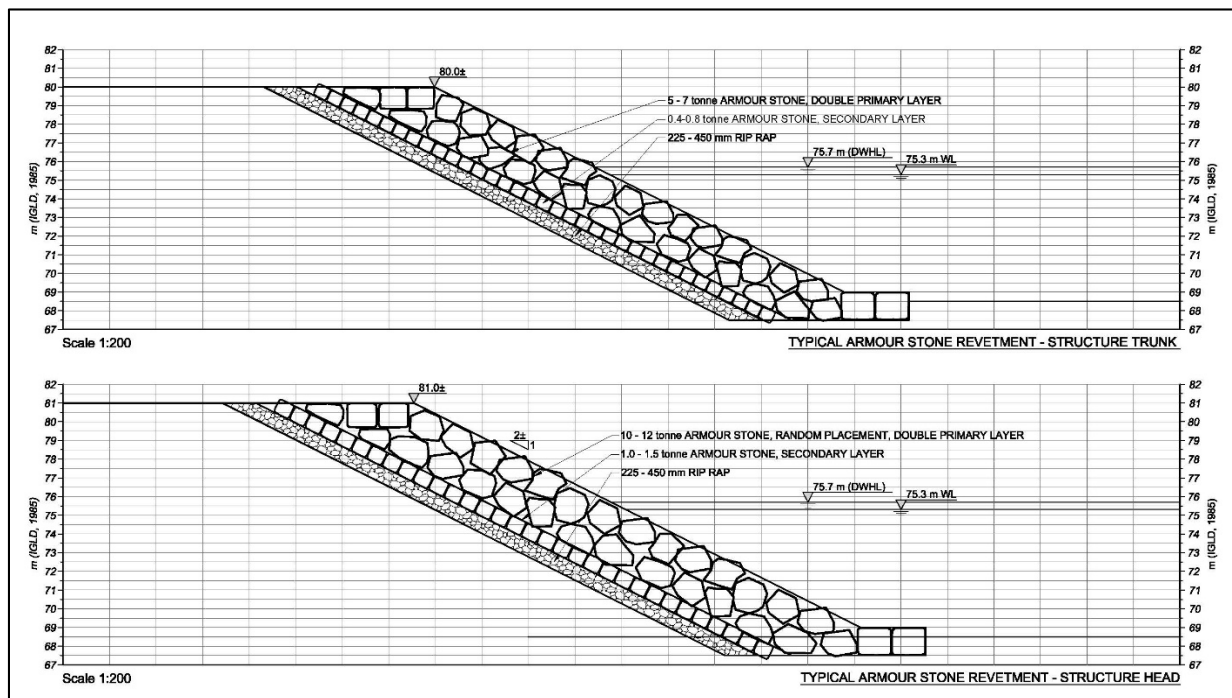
Concept design cross-sections for Option 1B, headland reconstruction. *Source: Shoreplan Engineering, 2017.
